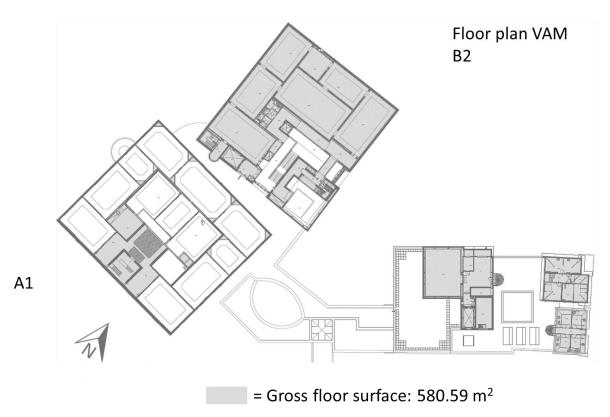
Floor plan A1 and B2, floor plan under layer by Cahen (2003).
